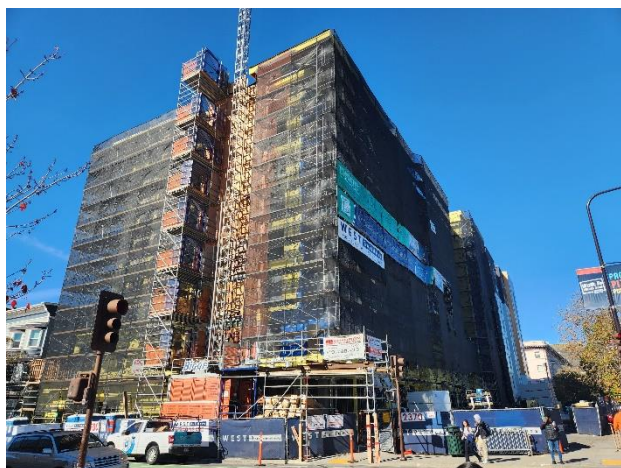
Phase two of Identity Logan Park at 2370 Shattuck Avenue, an eight-story mixed-use multifamily building under construction. Looking northwest.
